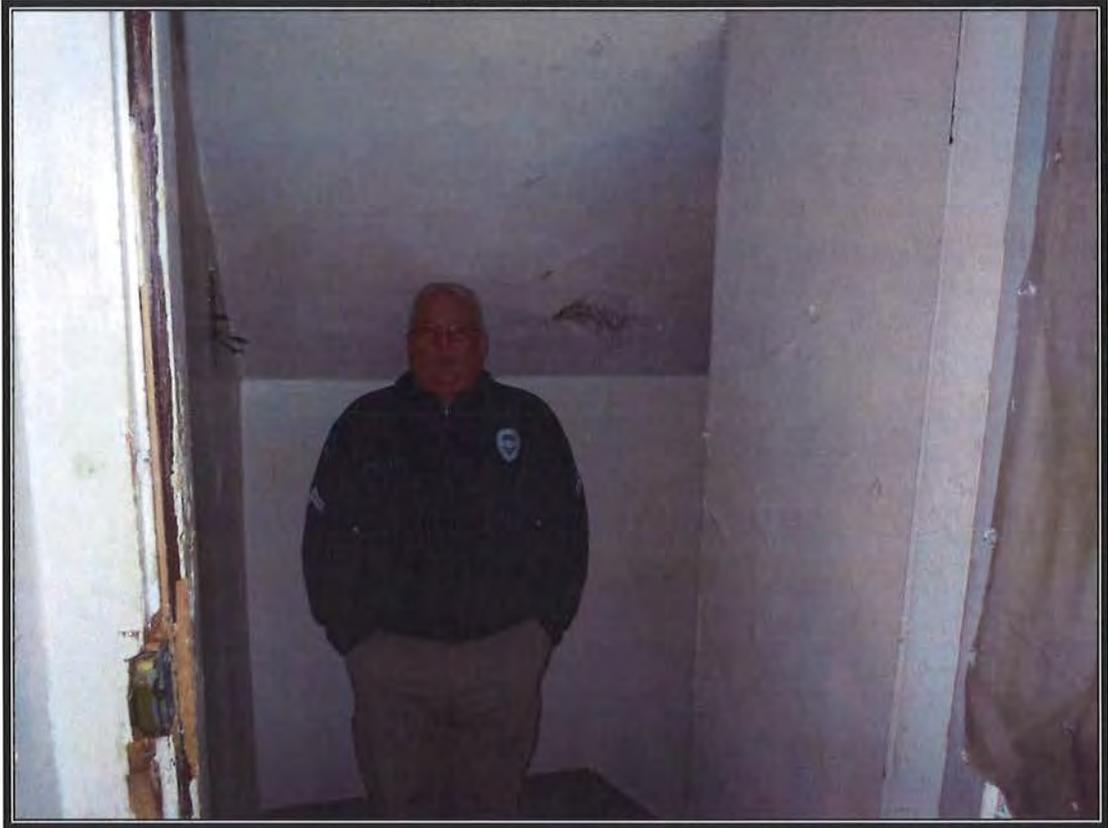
Attempts to repair ceiling damage due to roof leak.
